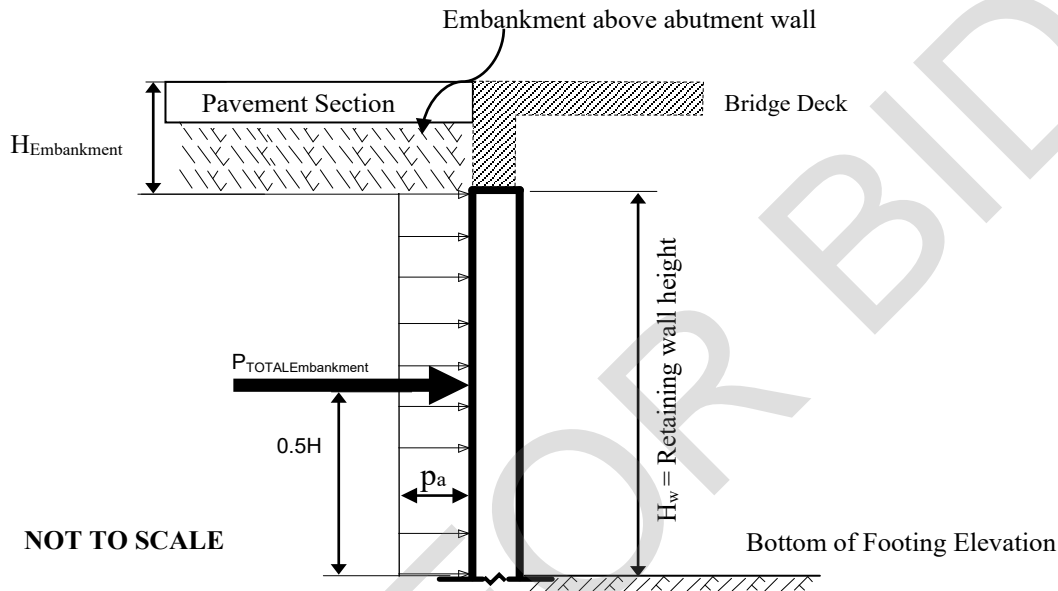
Loading Diagram of Lateral Earth Pressures Induced by the Embankment Surcharge behind the Abutment/Wing Wall
